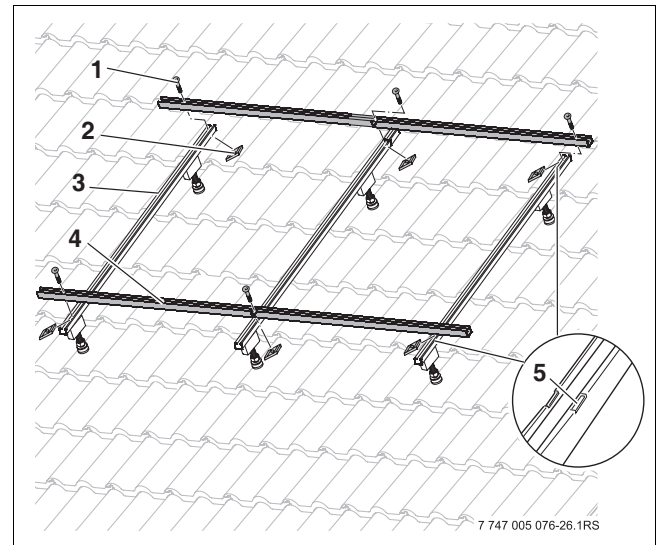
Securing flat roof/rooftop profile rail to collector profile rail
